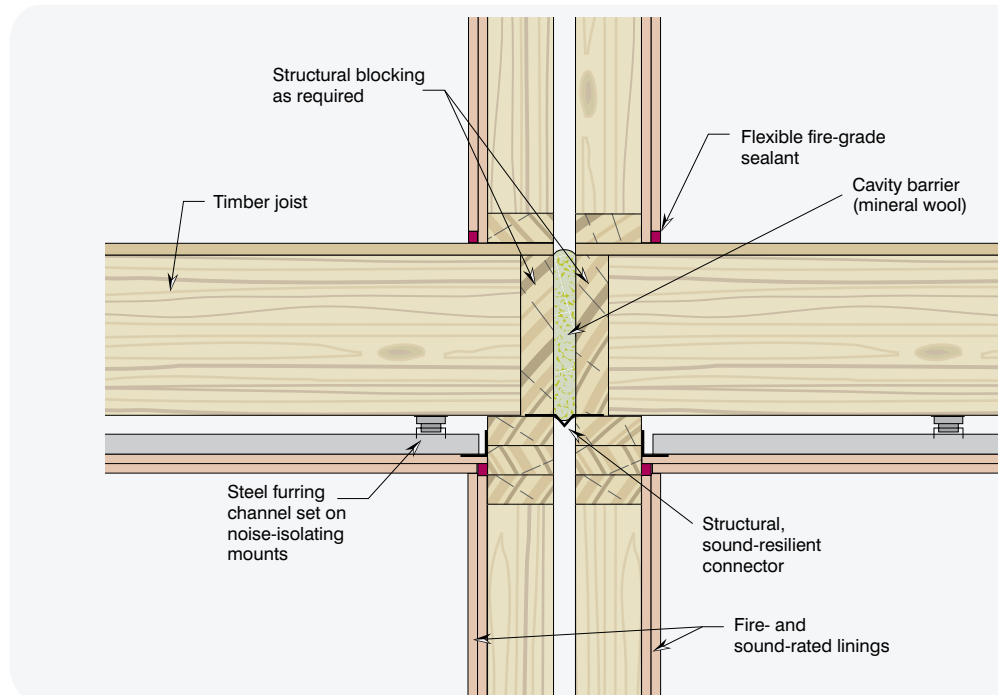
Truncated floor joists and floor sheet to reduce noise transfer.
